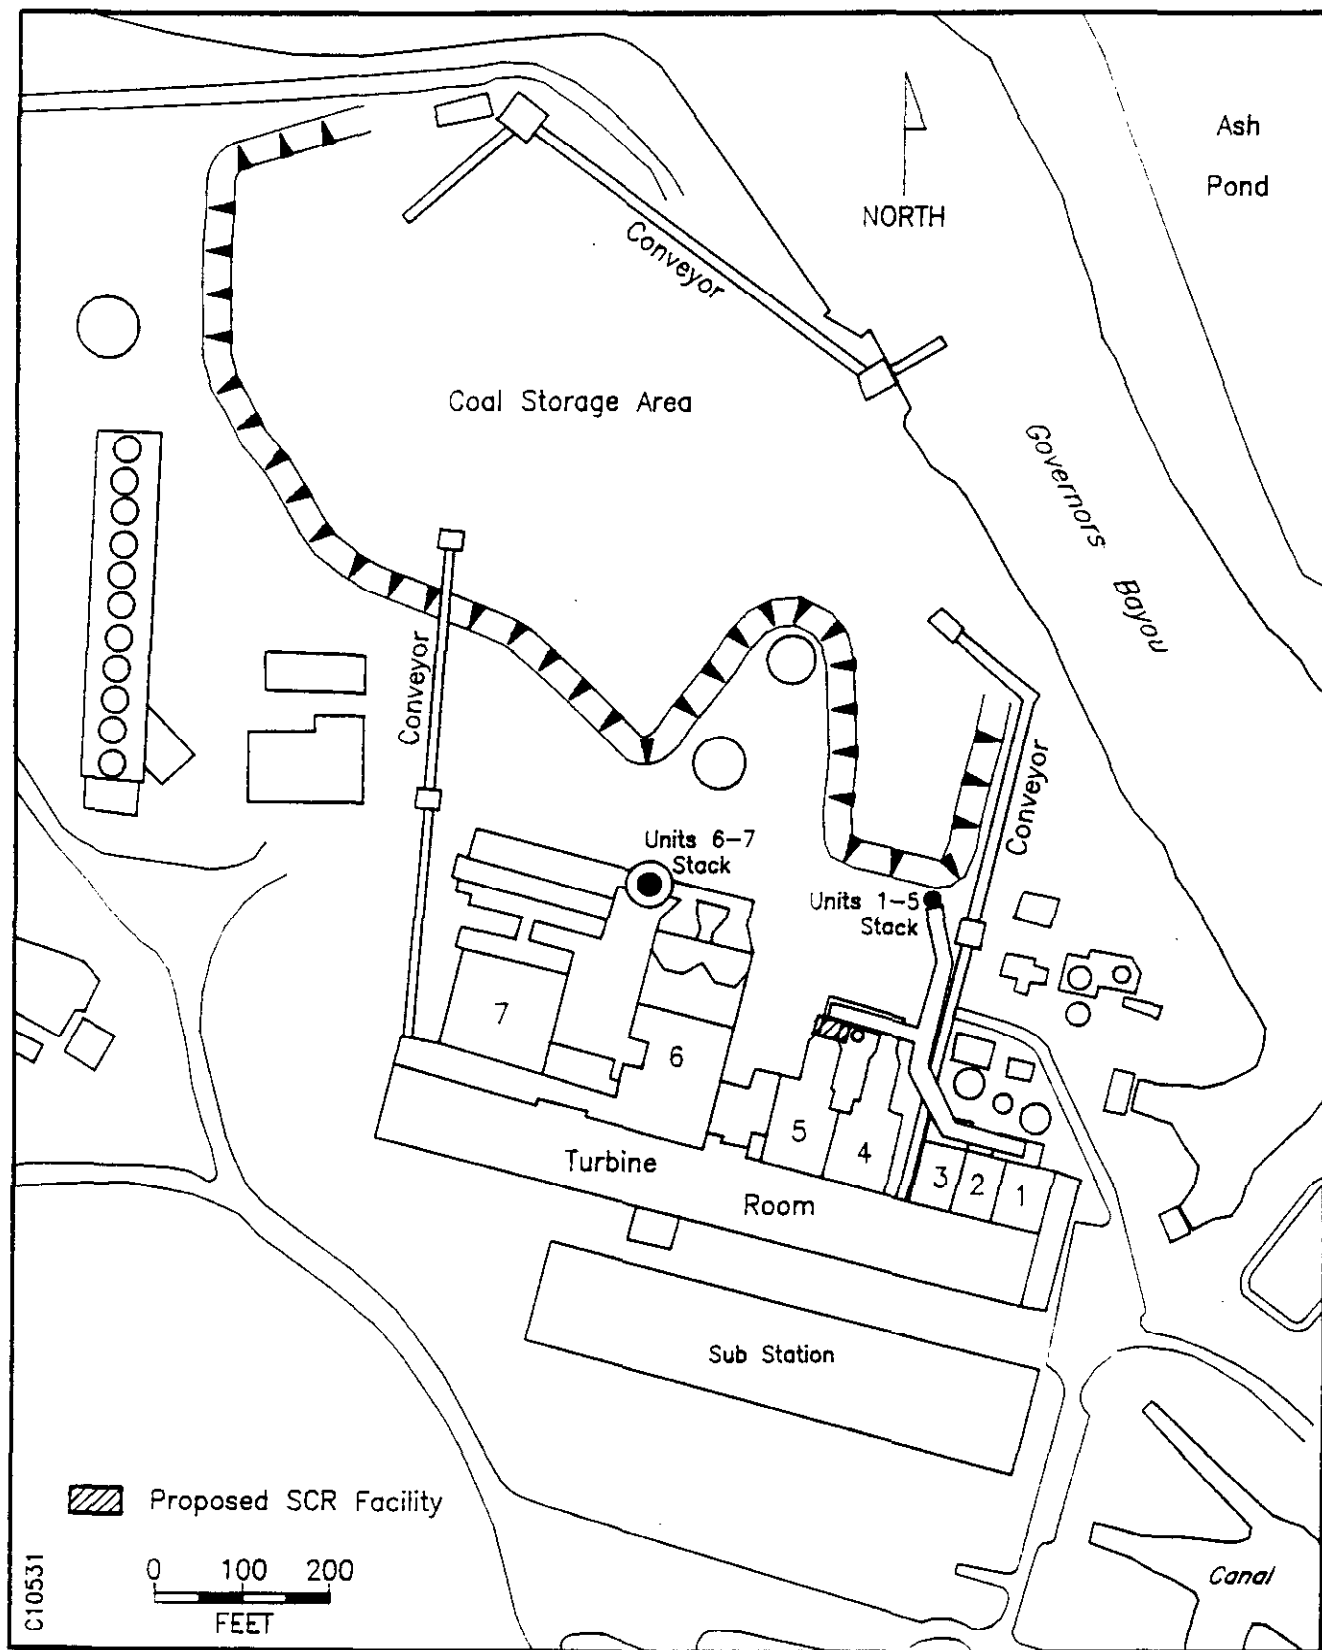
Detailed Layout of the Main Plant Area and the Proposed Site of the SCR Project
